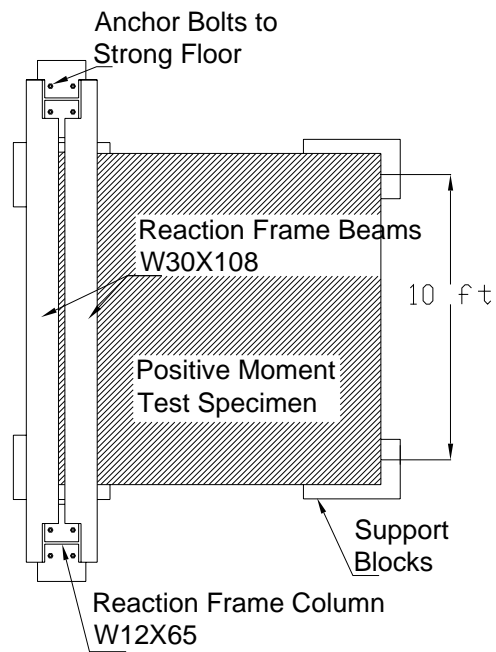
Plan View of Positive Moment Test Specimen Reaction Frame
